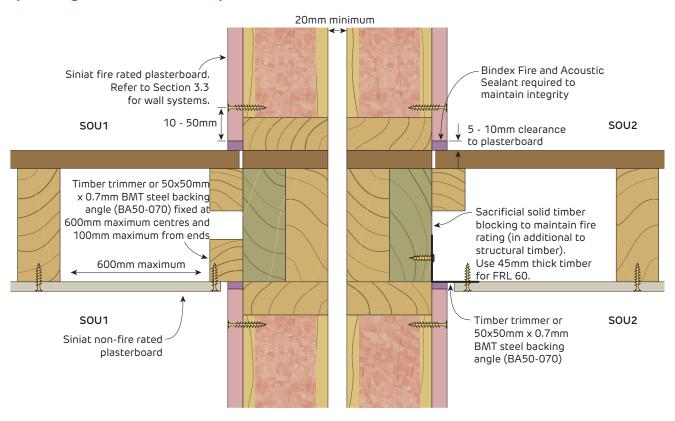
Separating Wall with Suspended Floor FRL 60/60/60 Fill any gaps with Bindex Section Fire and Acoustic Sealant 20mm minimum to maintain integrity Bindex Fire and Acoustic Siniat fire rated plasterboard. Sealant required to Refer to Section 3.3 maintain integrity for wall systems. 10 - 50mm SOU₂ SOU1 5 - 10mm clearance to plasterboard Timber trimmer in ceiling cavity or 50x50mm x 0.7mm BMT steel backing angle (BA50-070) fixed at 600mm maximum centres and 100mm maximum from ends Timber trimmer in ceiling cavity or 50x50mm x 0.7mm BMT steel backing angle (BA5Q-070) Siniat non-fire SOU2 -0111111 rated plasterboard Fill gaps with Sacrificial solid timber blocking to Bindex Fire and maintain fire rating (in additional SOU1 Acoustic Sealant to structural timber). Use 45mm thick timber for FRL 60.
